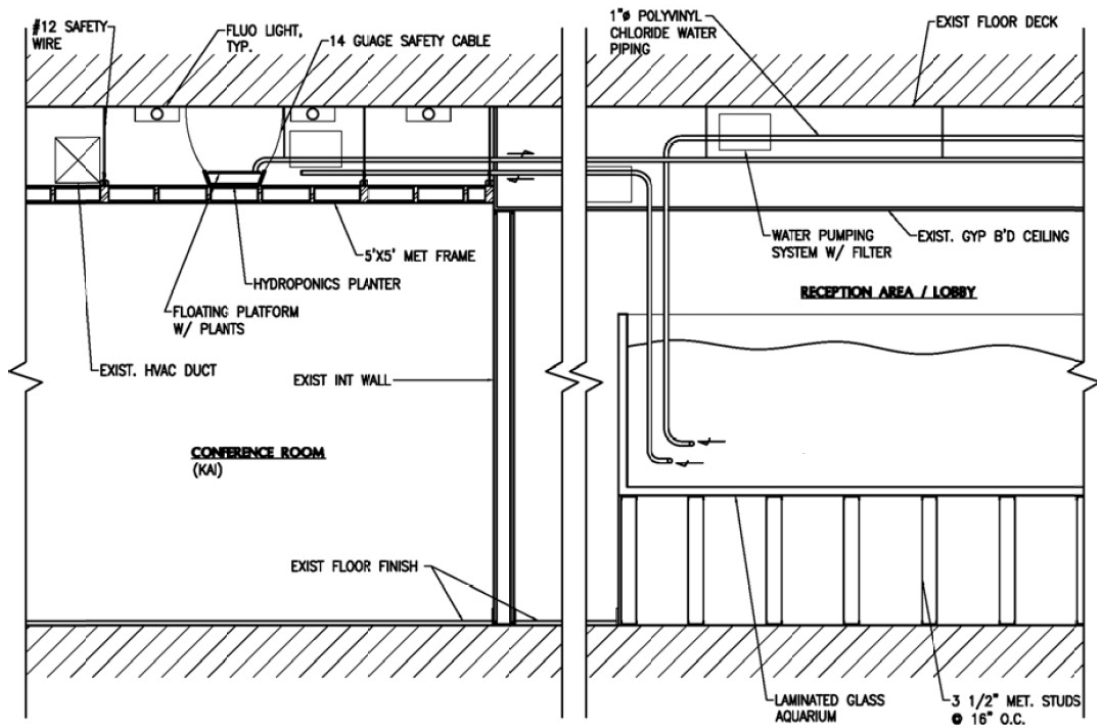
Wall Section Detail (Drawing prepared by Takao Ugai)
